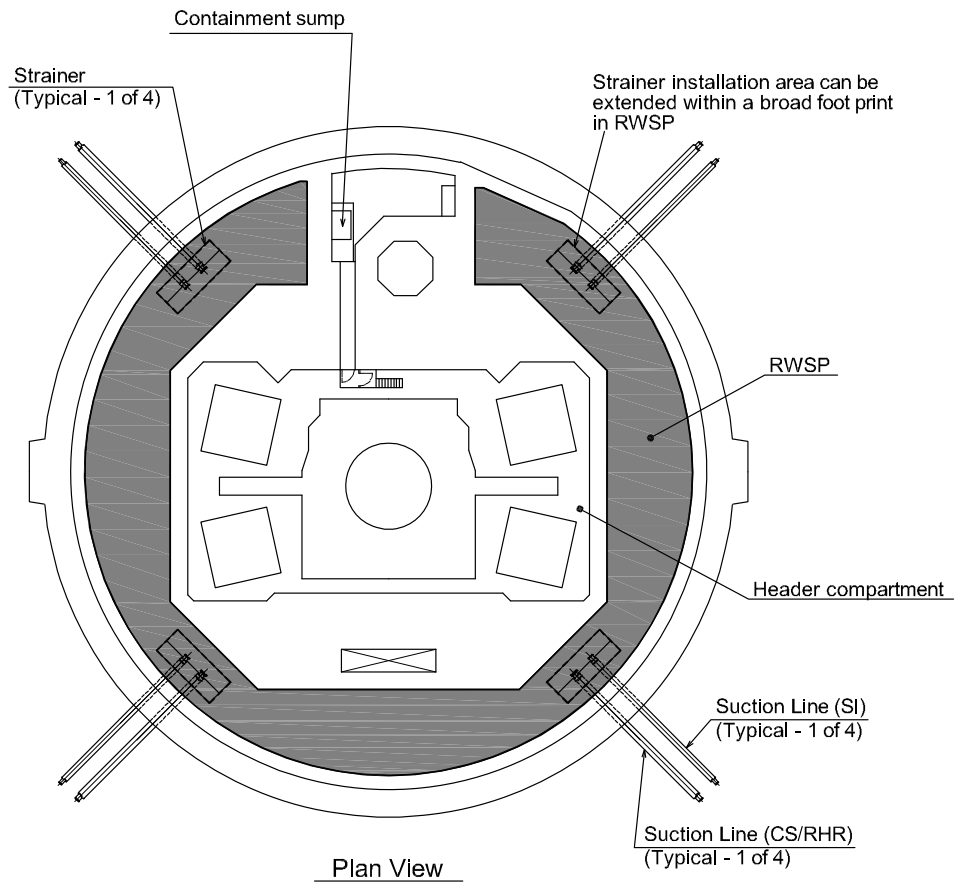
Plan View of RWSP and ECC/CS Strainers
